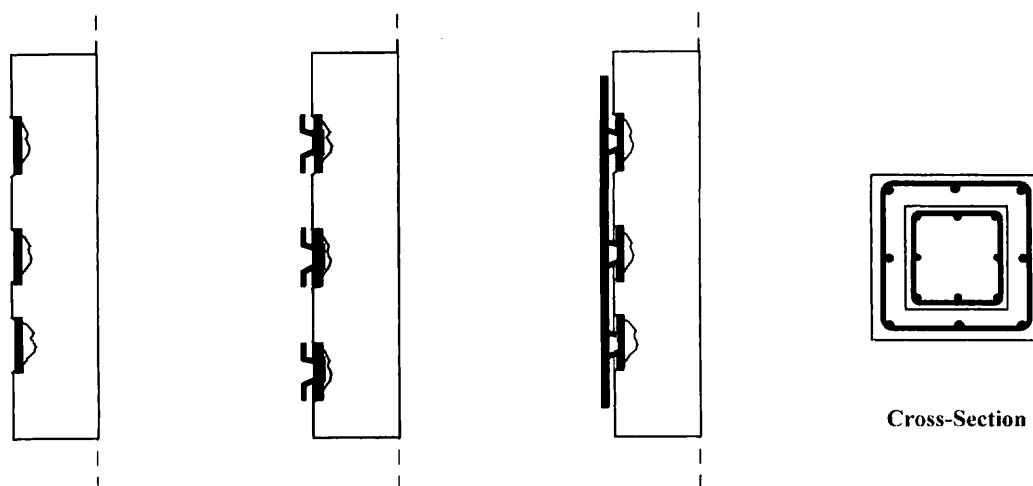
Concrete jackets with U-shaped rebars or steel plates welded to old and new corner bars for shear connection
